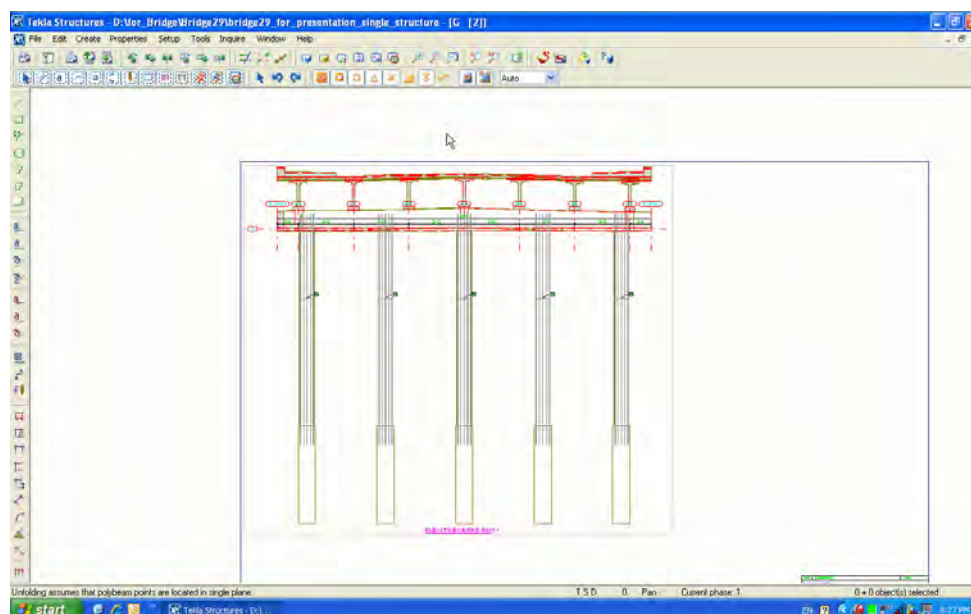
3-D bridge cross-section drawing extracted directly from 3-D model.
